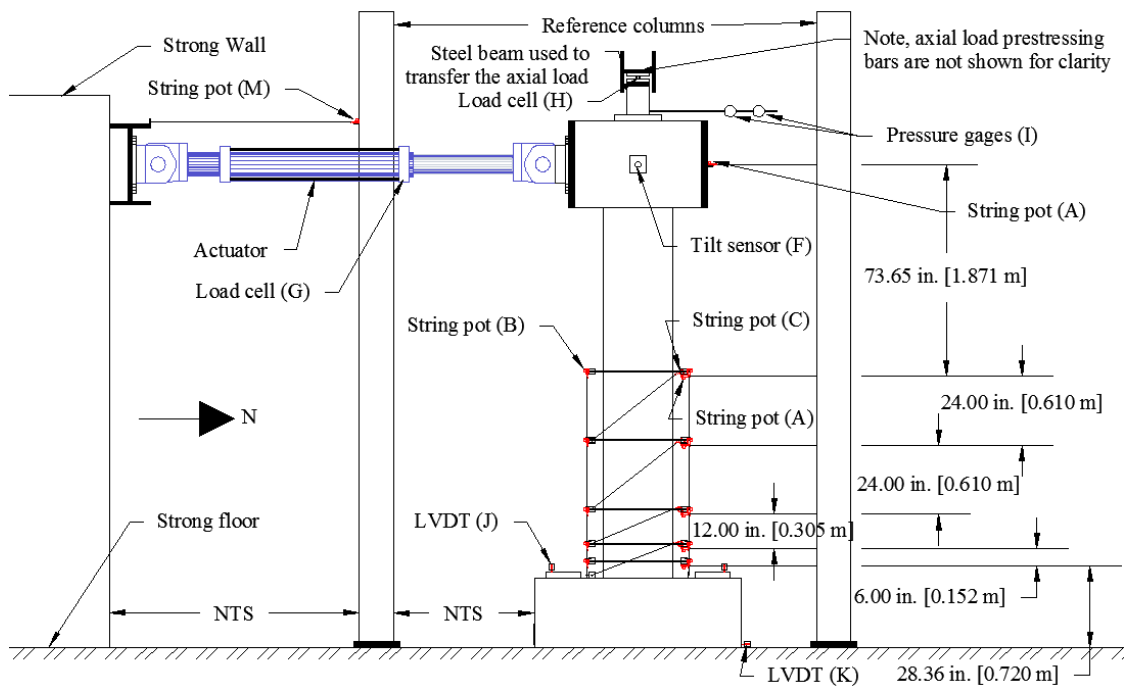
Columns G60-1, G80-1, G60-2 and G80-2 external instrumentation (NTS = not to scale)
